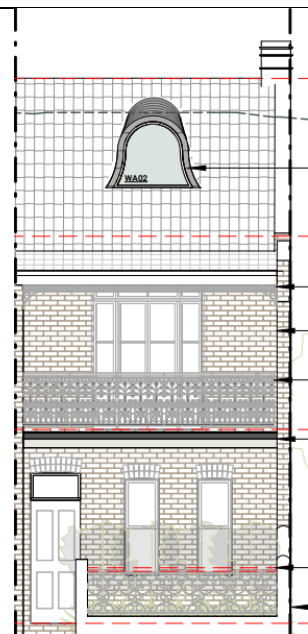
The proposed dormer will destroy the consistency of the front elevation of the pair of houses
